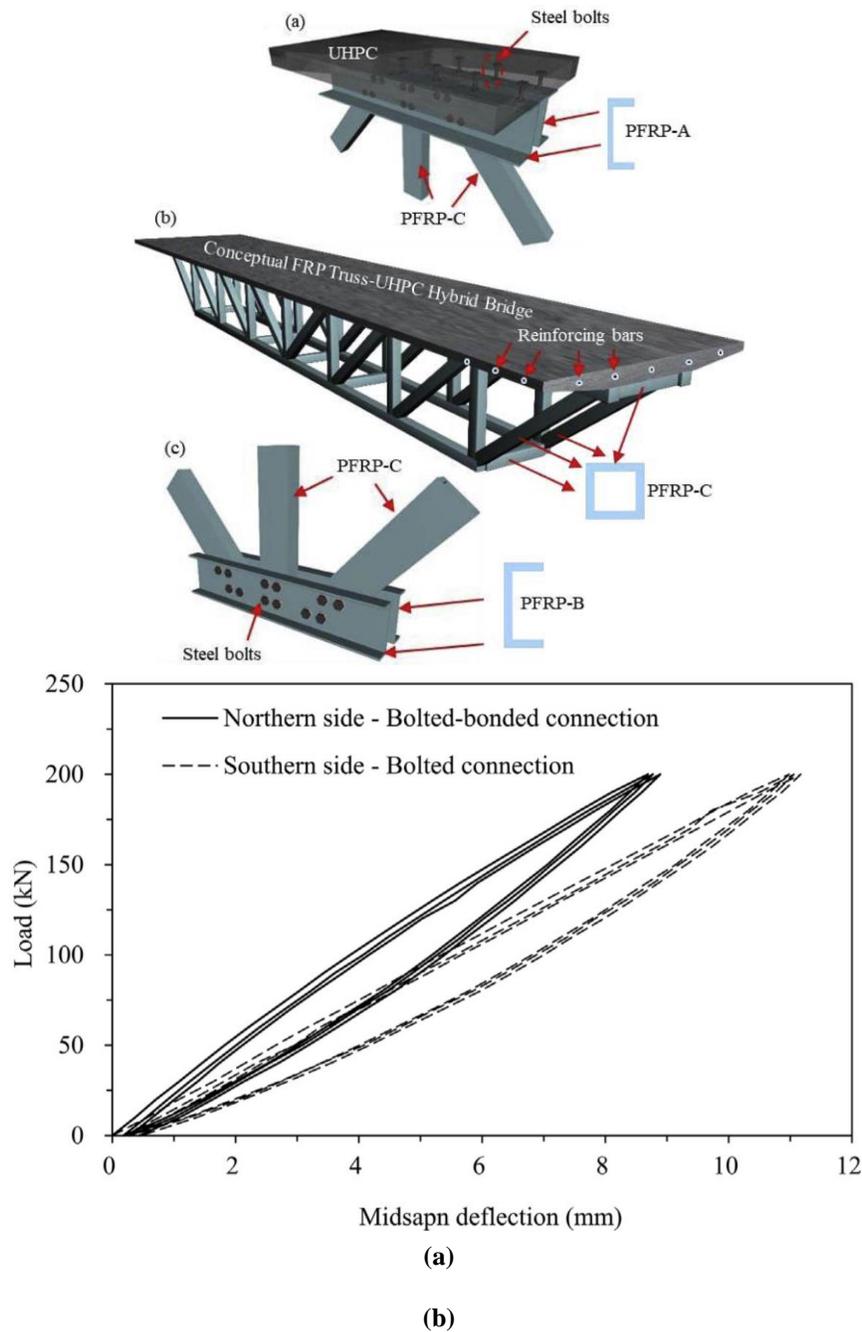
(a) The proposed FRP truss-UHPC slab hybrid bridge, (b) load-deflection response of cyclic loading (Zou and Wang (2018)).
